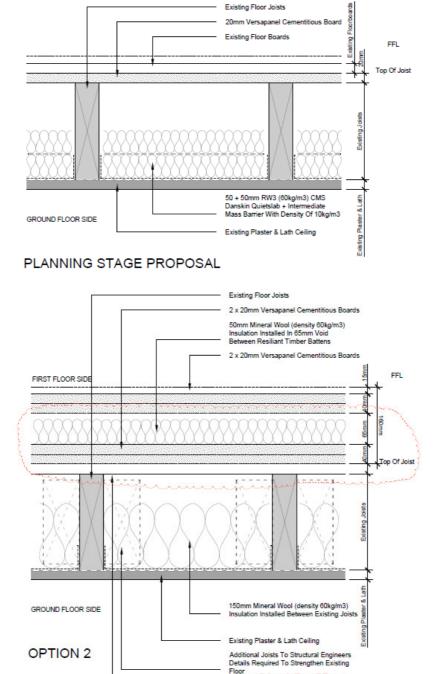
Approved LBC 2019 (top) and newly revised proposed scheme (bottom – Option 2 as revised) physical attenuation measures first floor section
